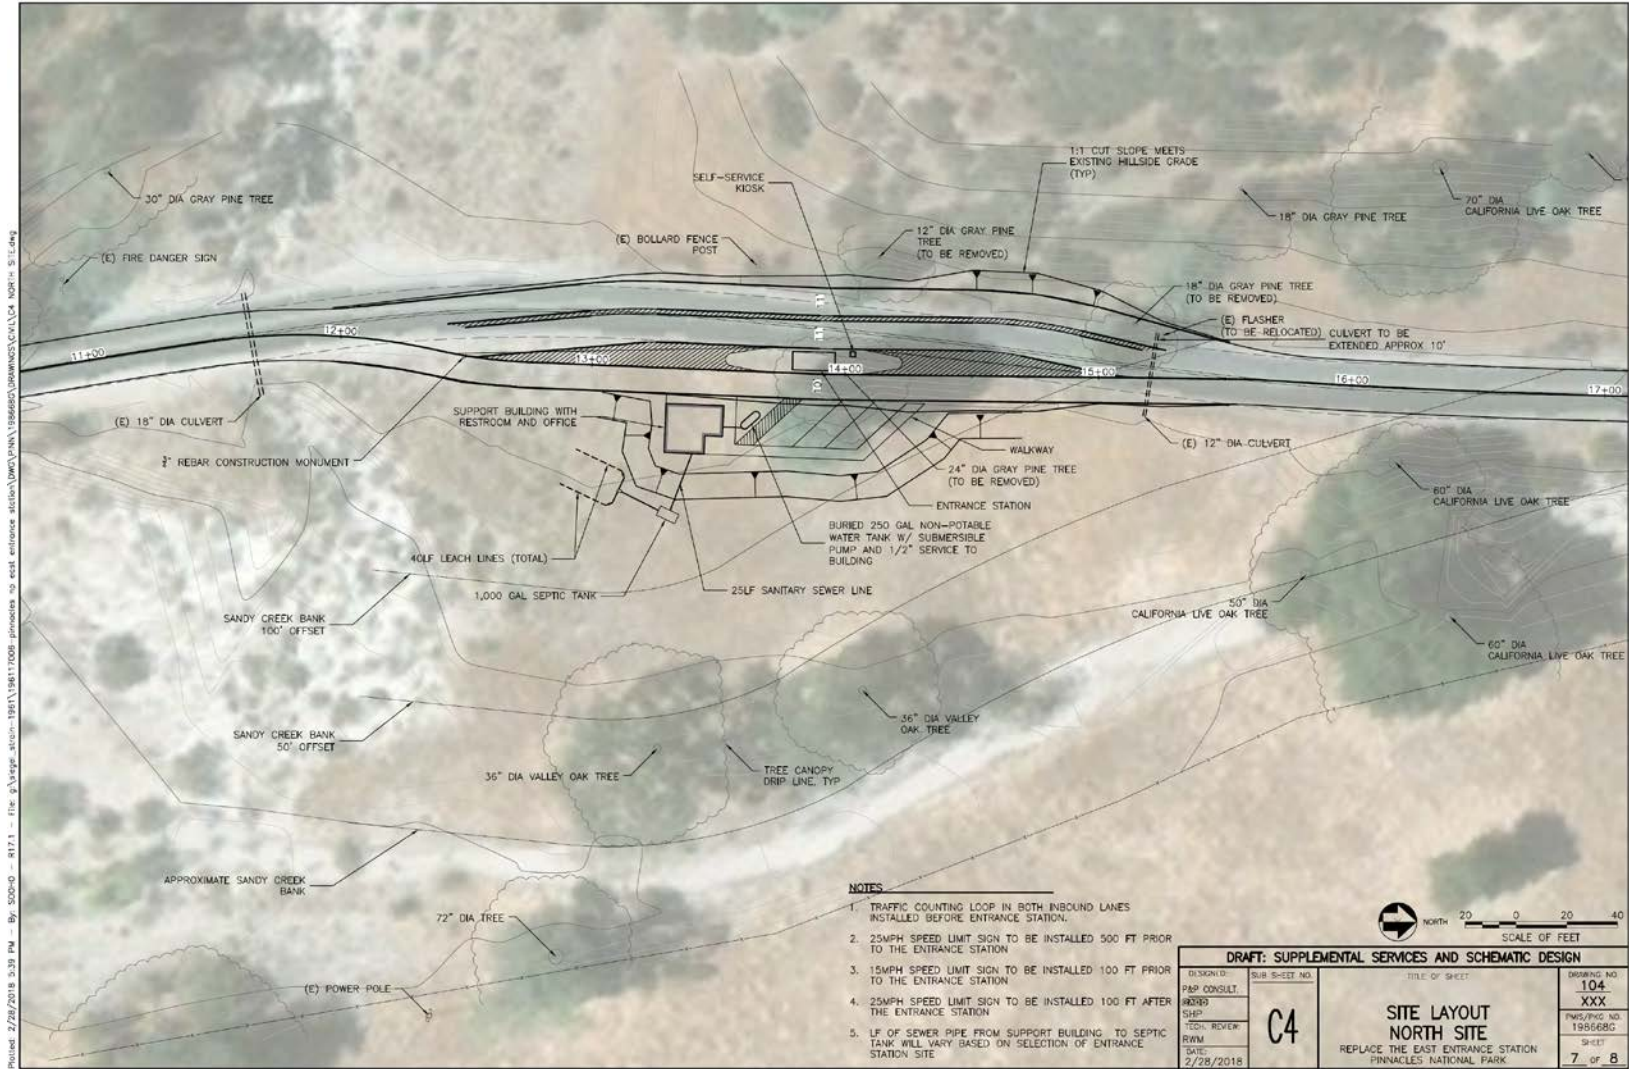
Proposed Location for Alternative 3 (North Site Entrance Facilities)
